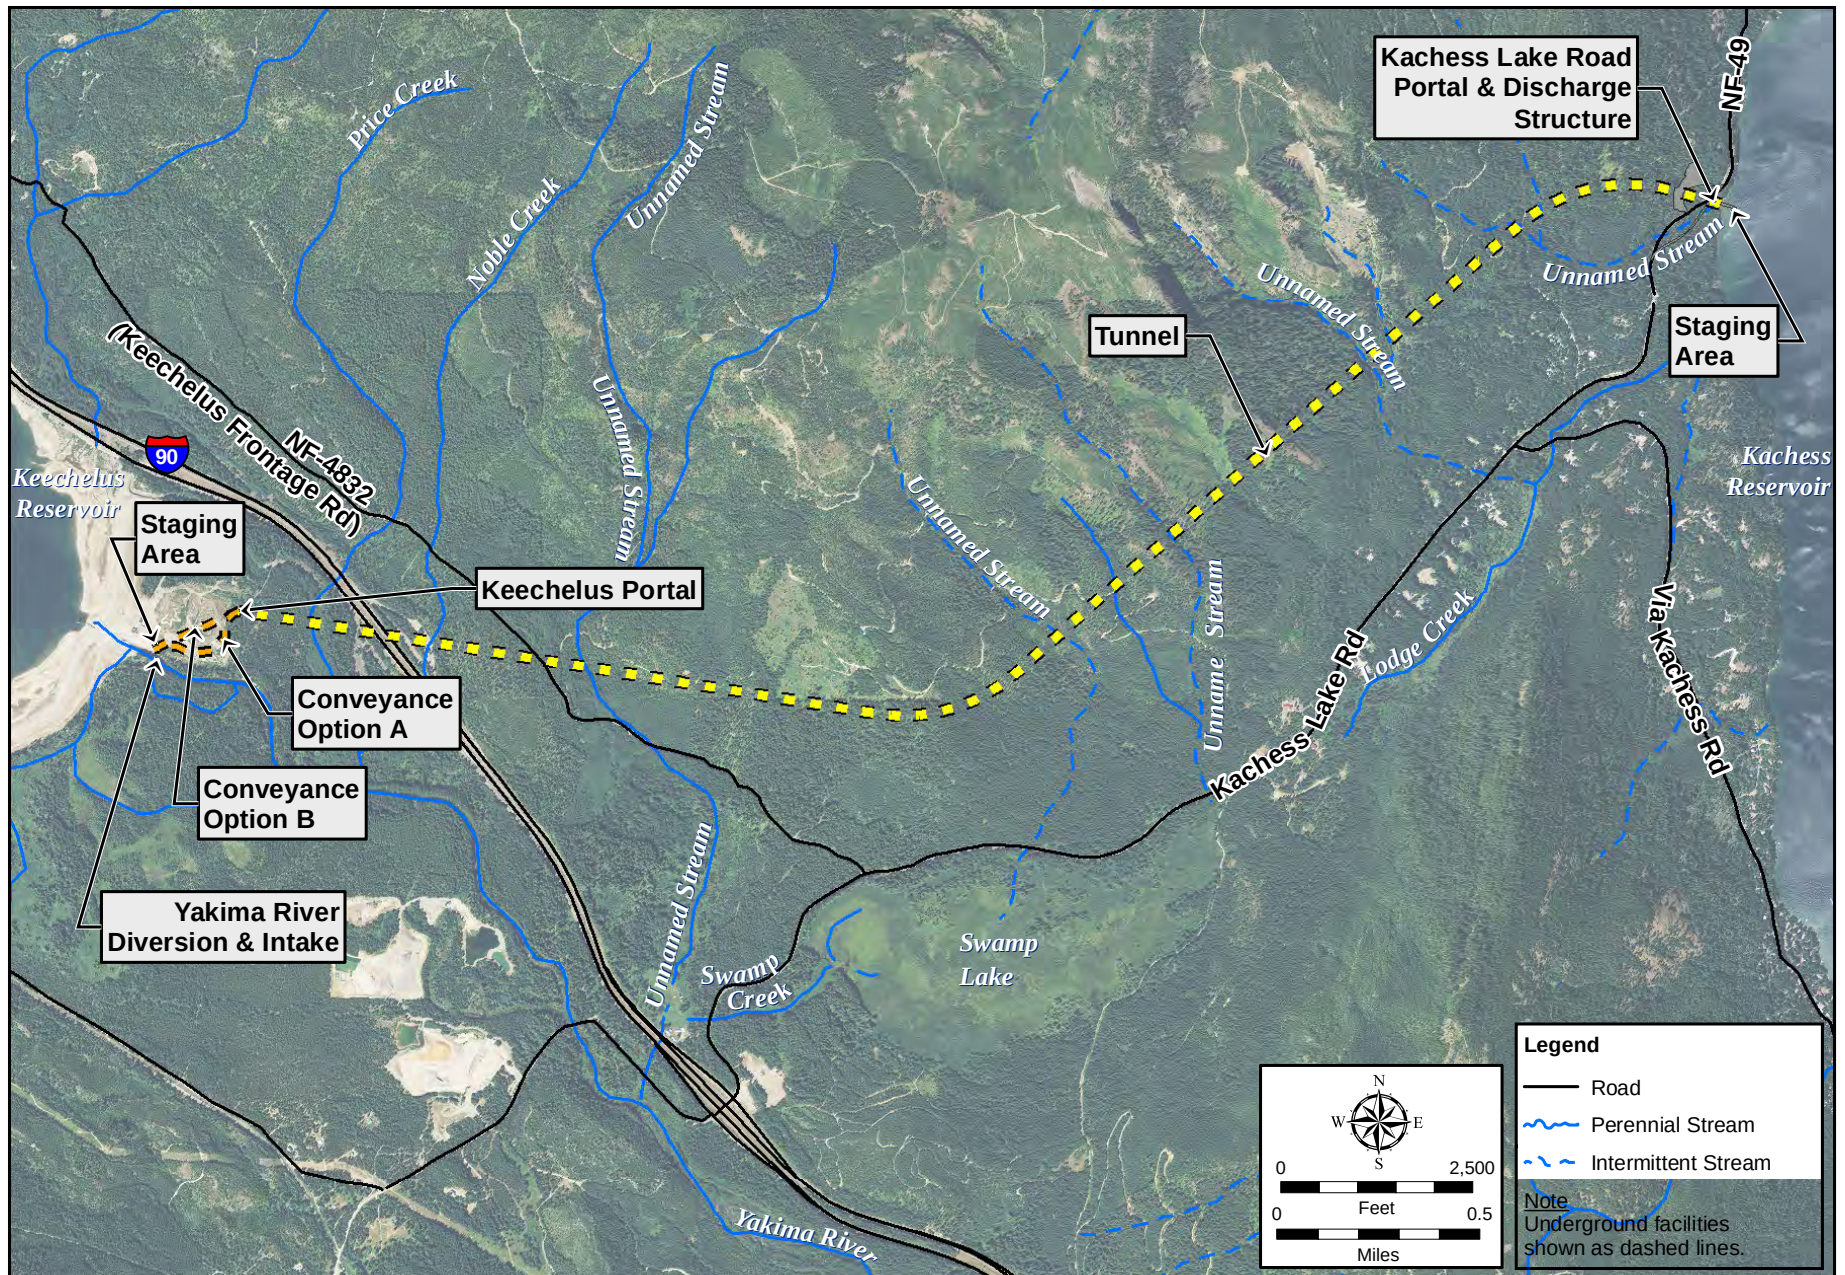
Alternative 3A – KKC North Tunnel Alignment Overview
